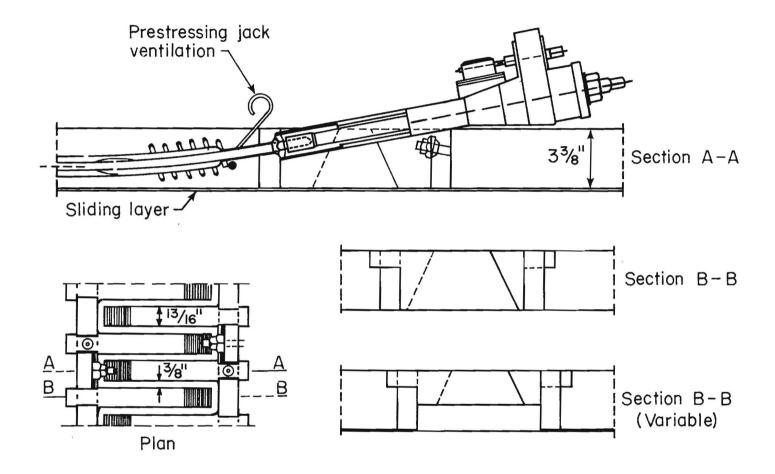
FINGER JOINT FOR ROAD AT MONTABAUR, GERMANY
